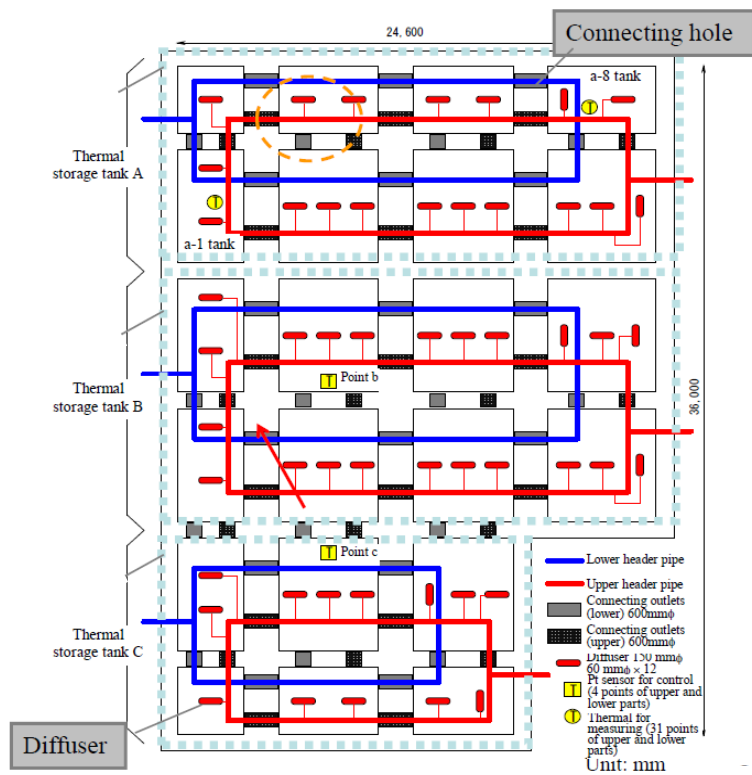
Configuration of the water TES tank (Distributor layout plan)
